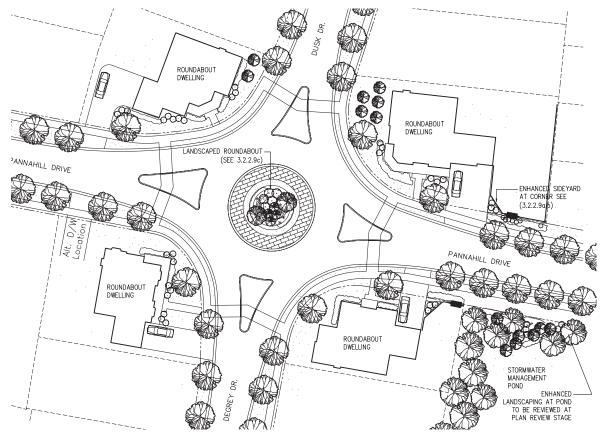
Executive Gateway - Concept Plan
